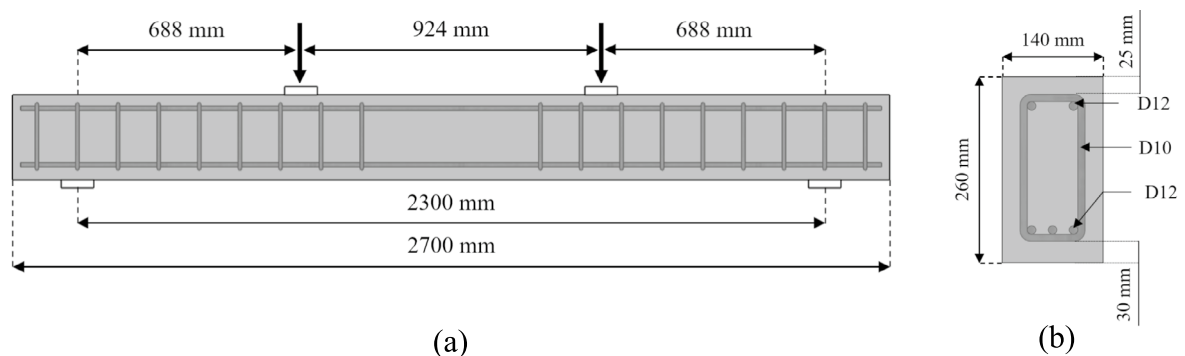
Details of the beam specimens. a Loading arrangement. b Section details
